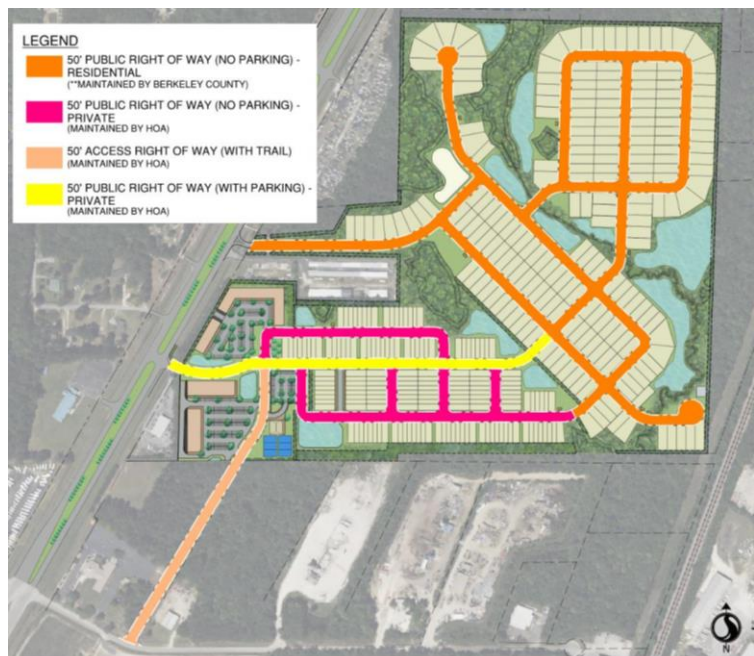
Transportation Plan (Appx. Exhibit 10)
